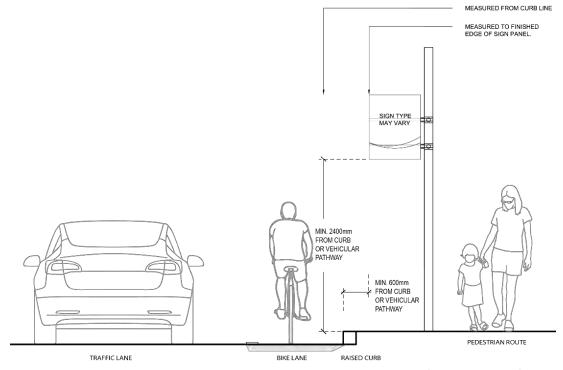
Urban Street & AT Route Signage Placement. Min. 600mm edge of sign to edge of curb. Min. 2400mm vertical clearance to bottom of sign
